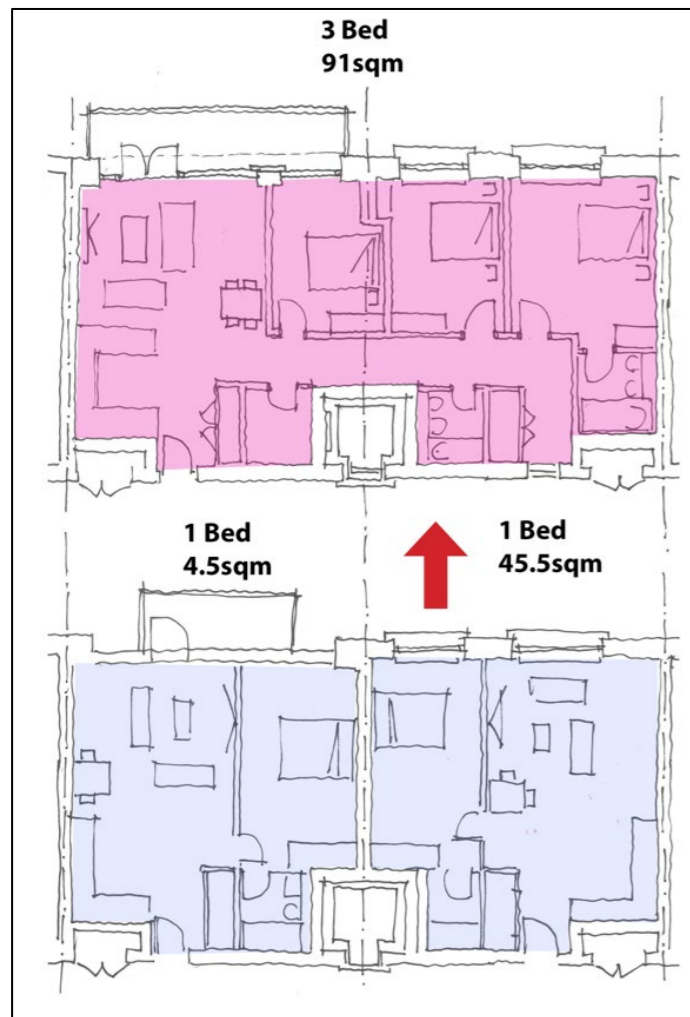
Diagram showing how two adjoining 1-bed units, could in future be combined to provide a 3 bed unit, this would require changes to the internal layout and a larger balcony. (Source: RAU Diagram, 2023.)
